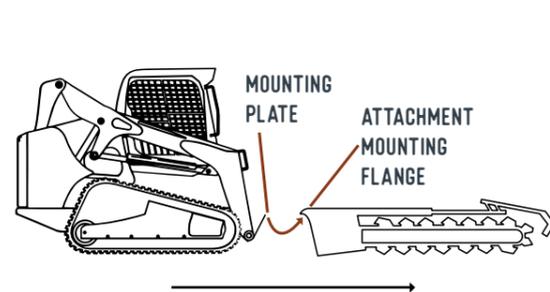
Skid Steer Mounting Plate to Attachment Mounting Flange
